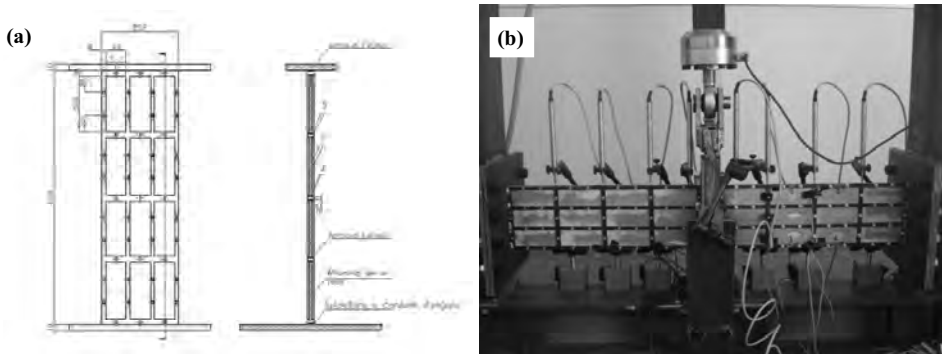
Aluminium-steel hysteretic damper: (a) dimensions for the JETPACS frame; (b) test set-up.
